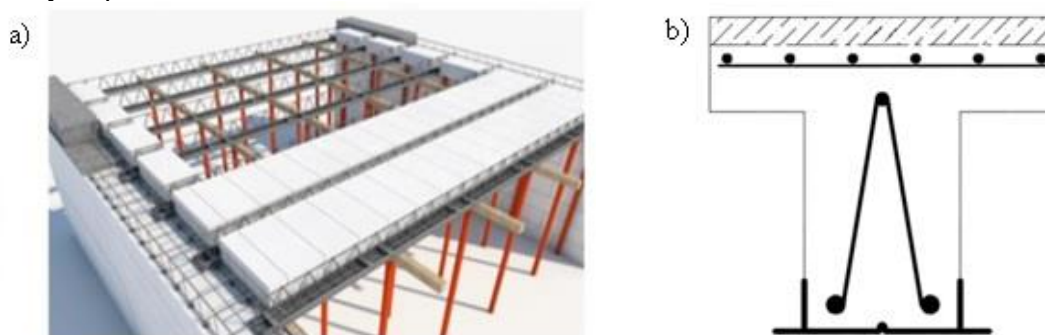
Prefabricated monolithic slab: a) general view; b) cross-section of the beam element
